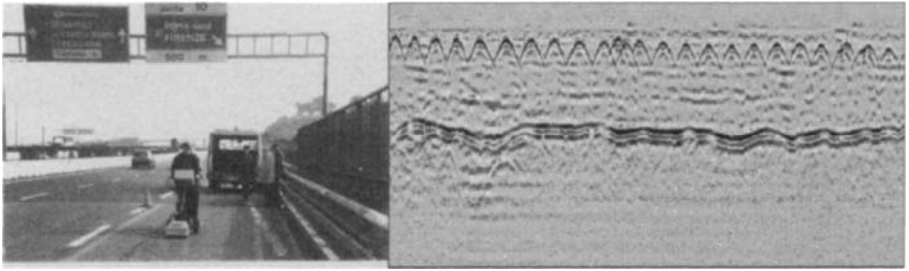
GPR survey of road pavement showing reinforcing and sub-base layer (courtesy ERA Technology)
